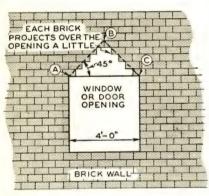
Window or Door Opening in a Brick Wall and Spandrel
